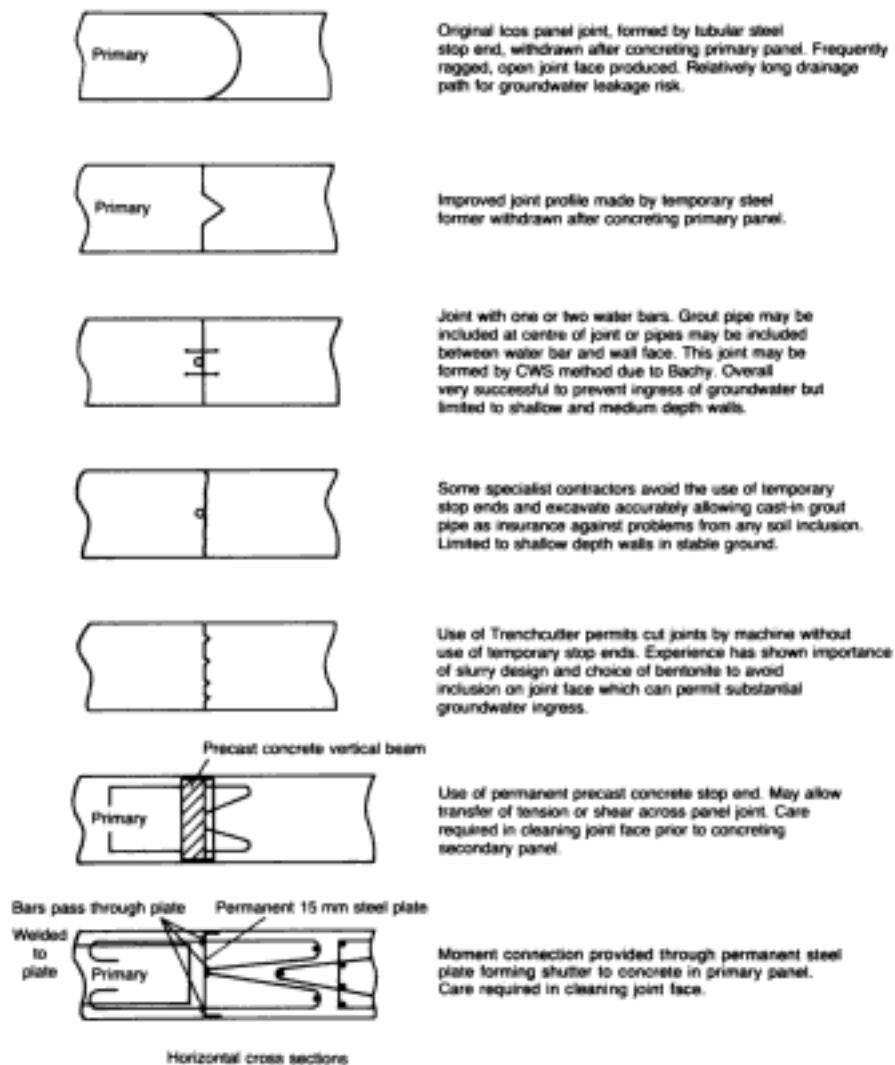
Types of vertical panel joint used in diaphragm walling, shown in horizontal section
